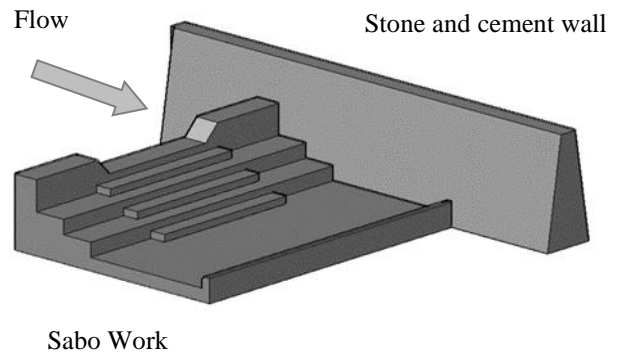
The layout of Sabo work and wall for the Kalachay Bridge
